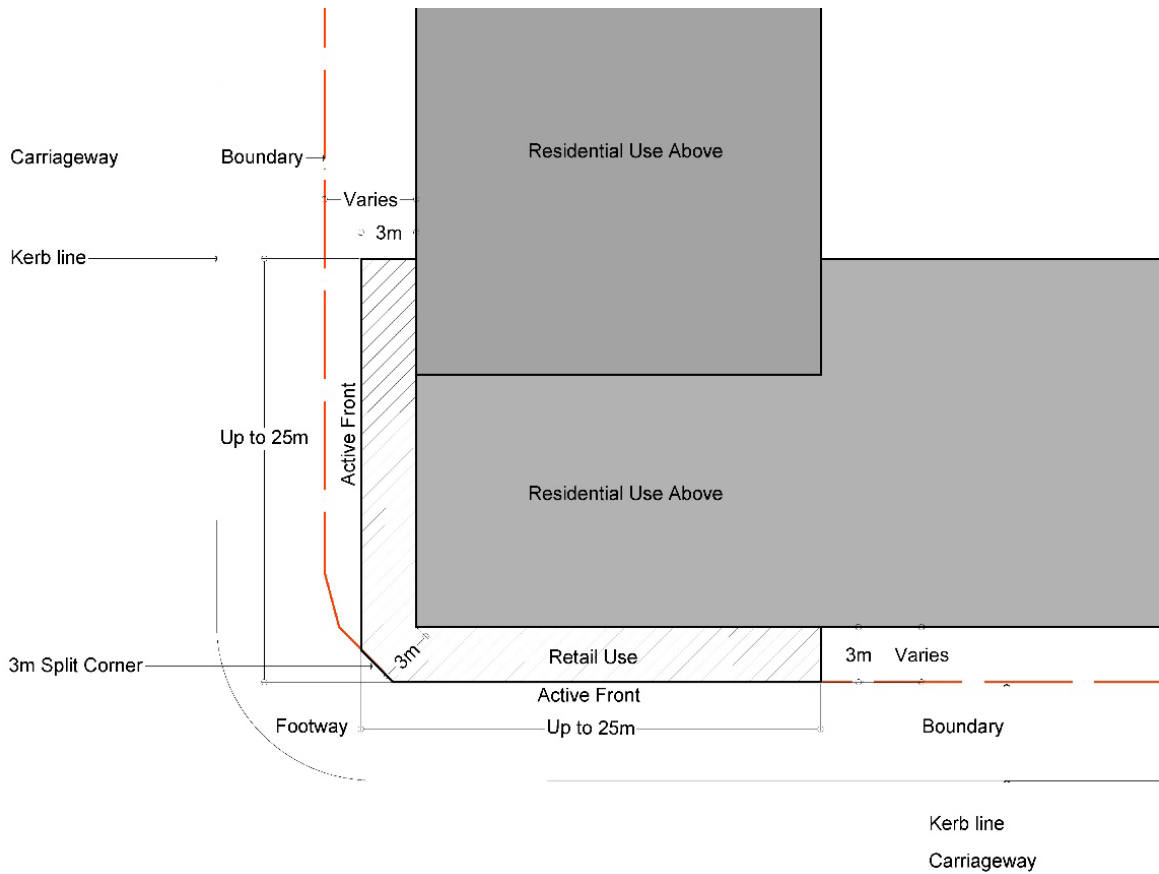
Indicative Corner Activation at Key Intersections, Plan (NSR 2 and EWR 4 Highest Priority and NSR 3 and EWR 4 Second Highest Priority)
